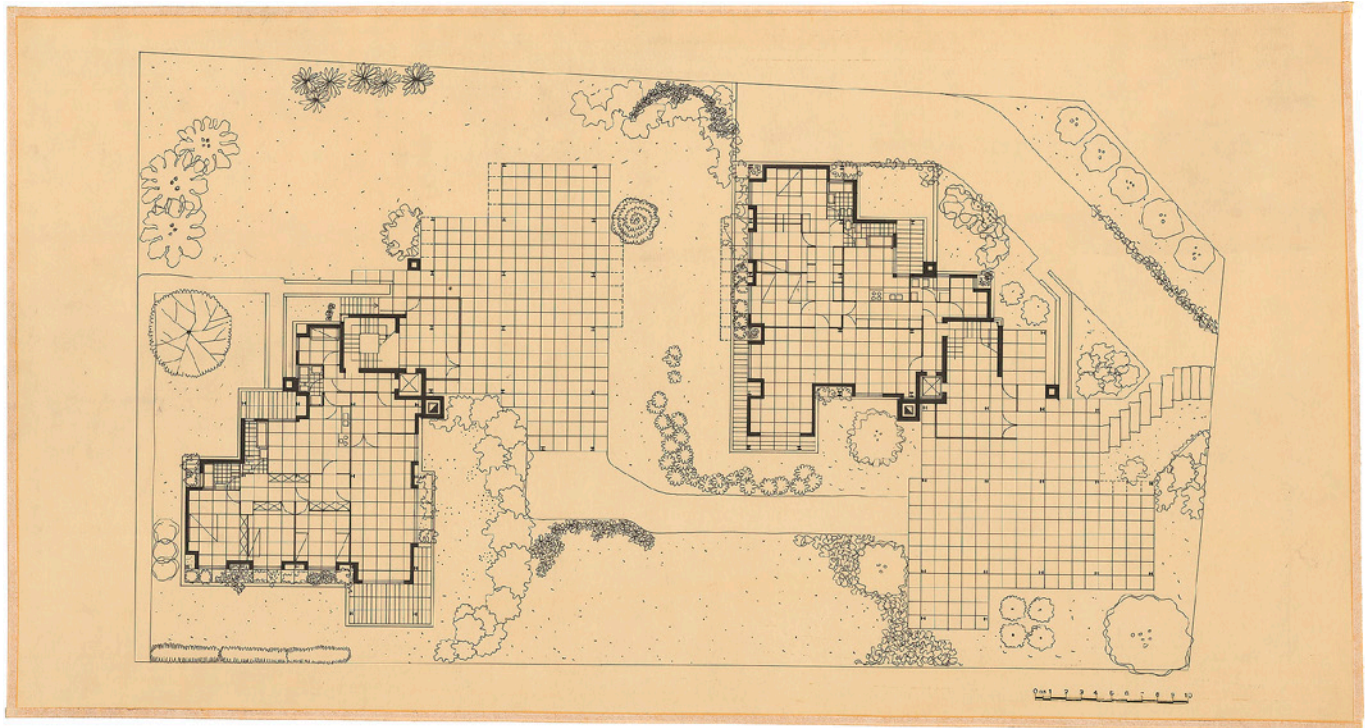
FEAL Houses on Laveno Street floor plan. Source: Archivio del Moderno, Fondo Marco Zanuso, Balerna.
